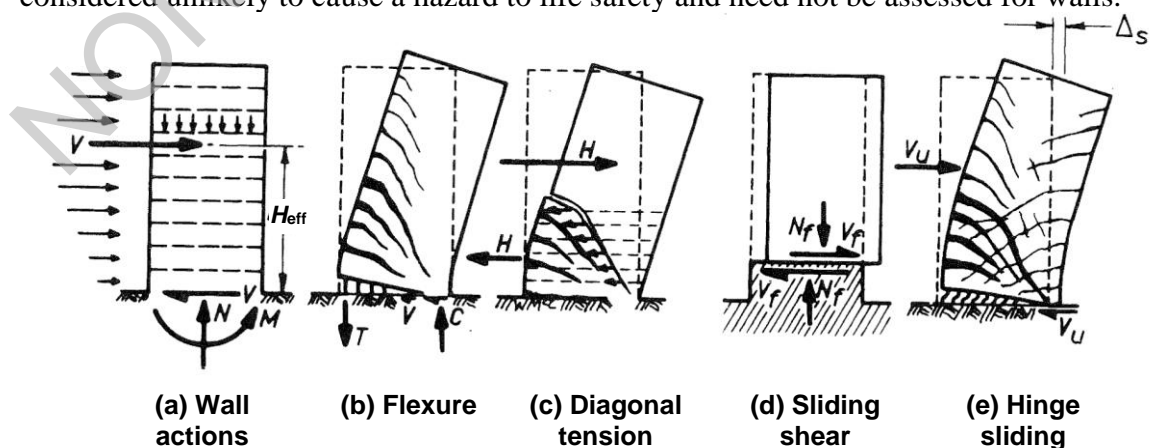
Various failure modes of cantilevered shear walls (Paulay and Williams, 1980)
